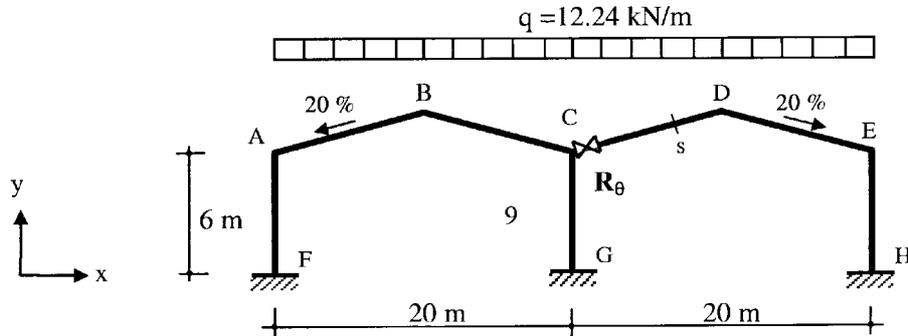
Features and loading of two spanned prefabricated reinforced concrete frame system
